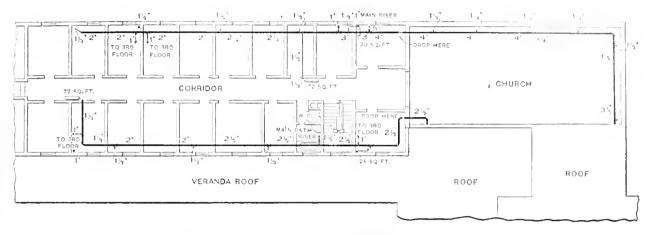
Plan of Second Floor, with Mains at Ceiling.
